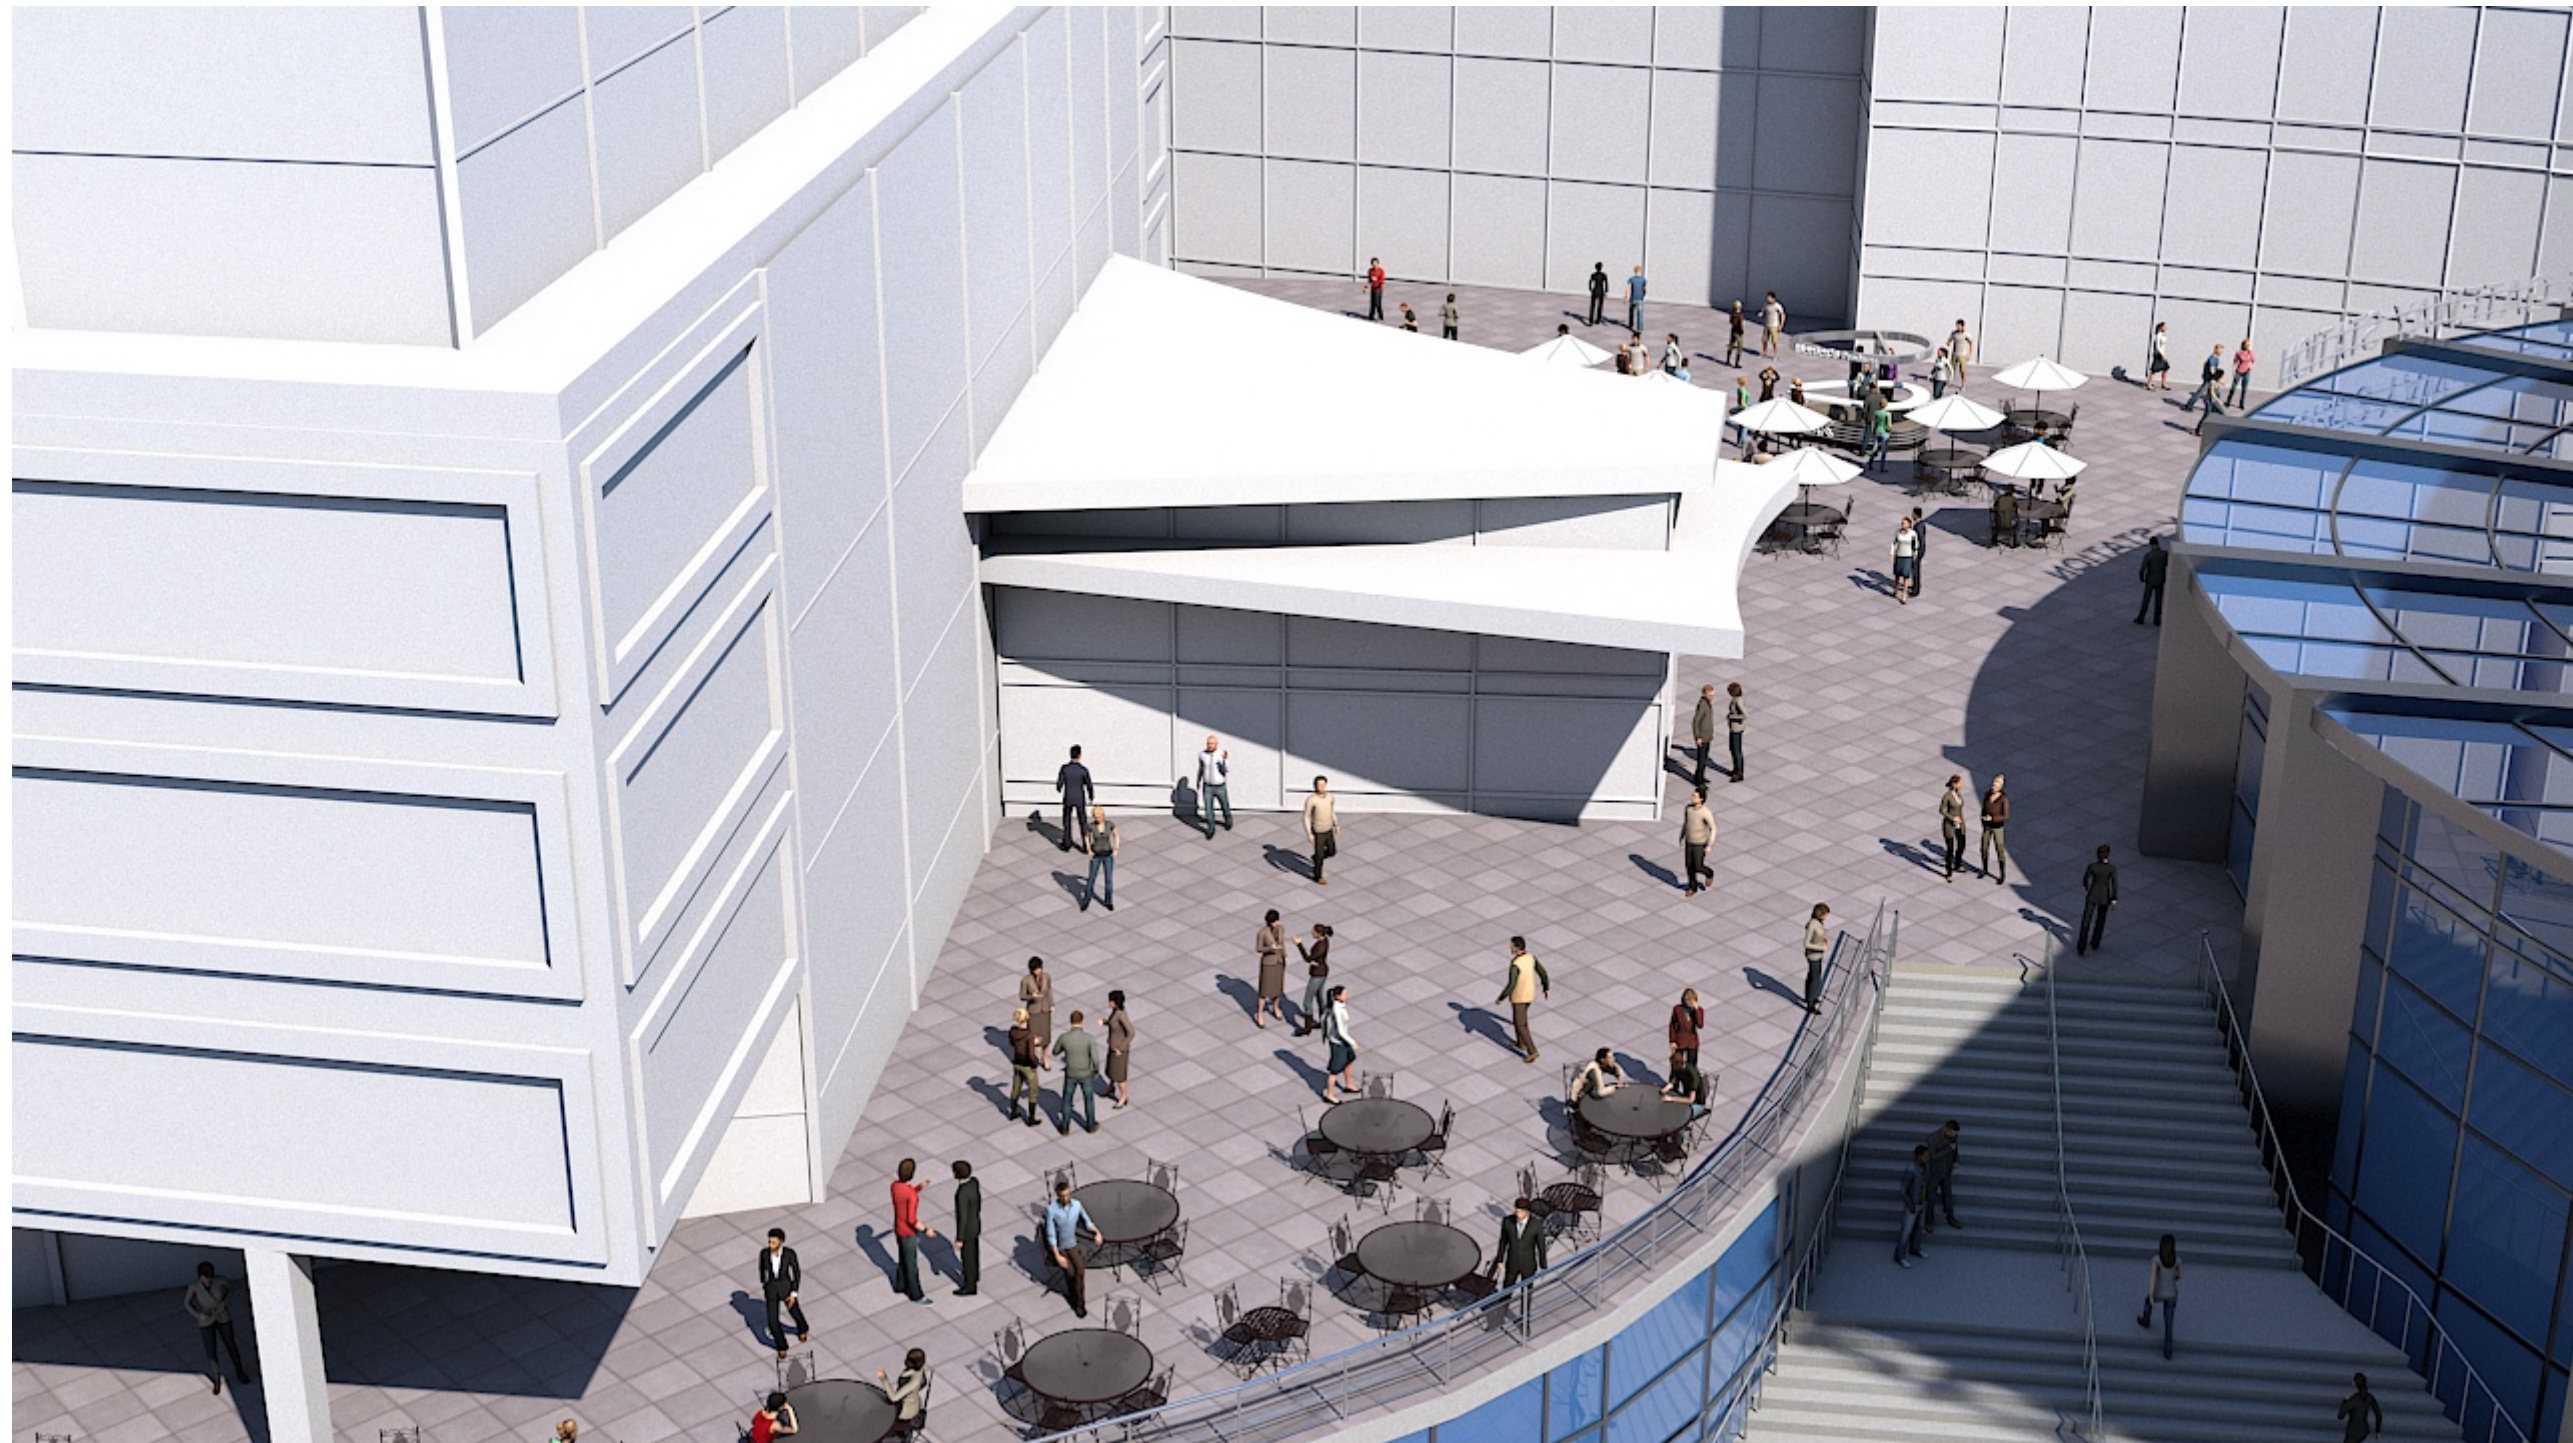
View of Rail Station Building Looking South from Wilkes Place
